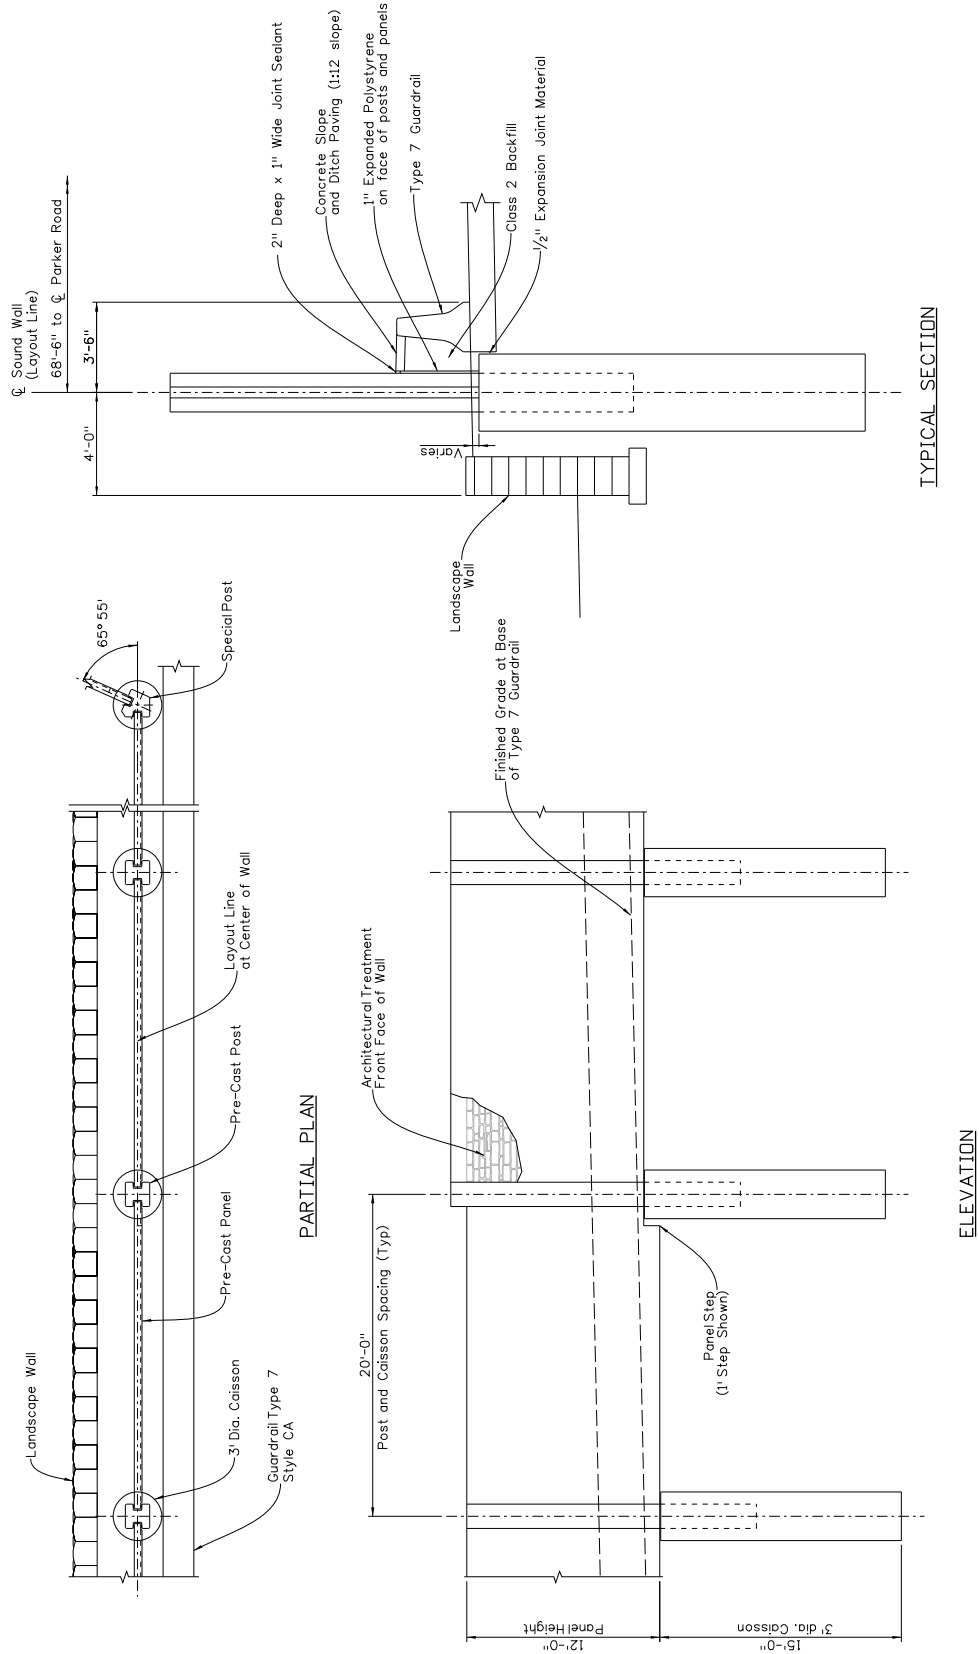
Precast Panel Sound Barrier Example
